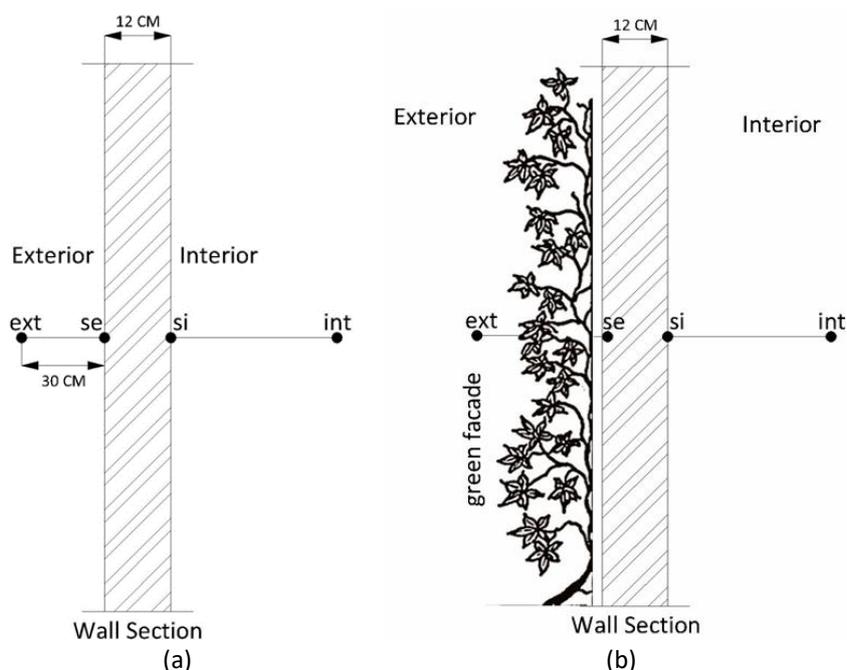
Illustration of the wall elements with or without green facade: (a). Bare wall section; (b). Green facade section [16]
